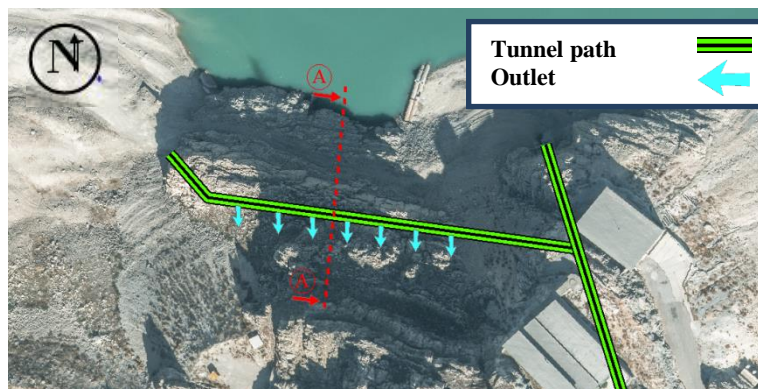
Schematic location of diversion tunnel 01 and its connection to Joint LP
